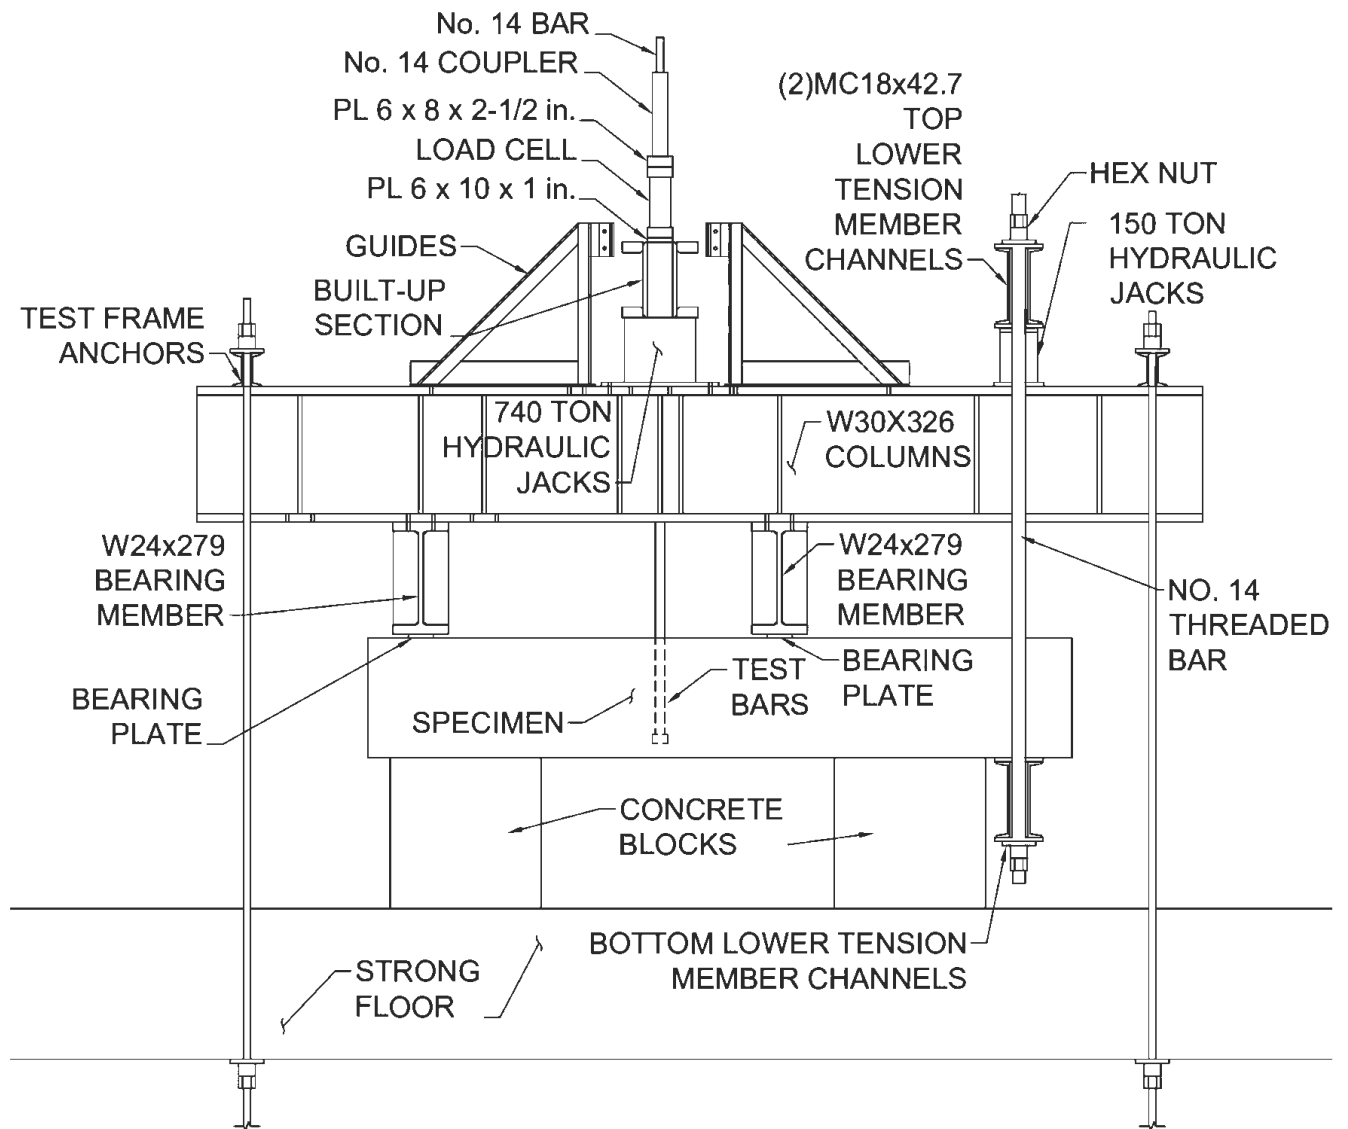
Side elevation of the reaction frame for the No. 14 bar setup
